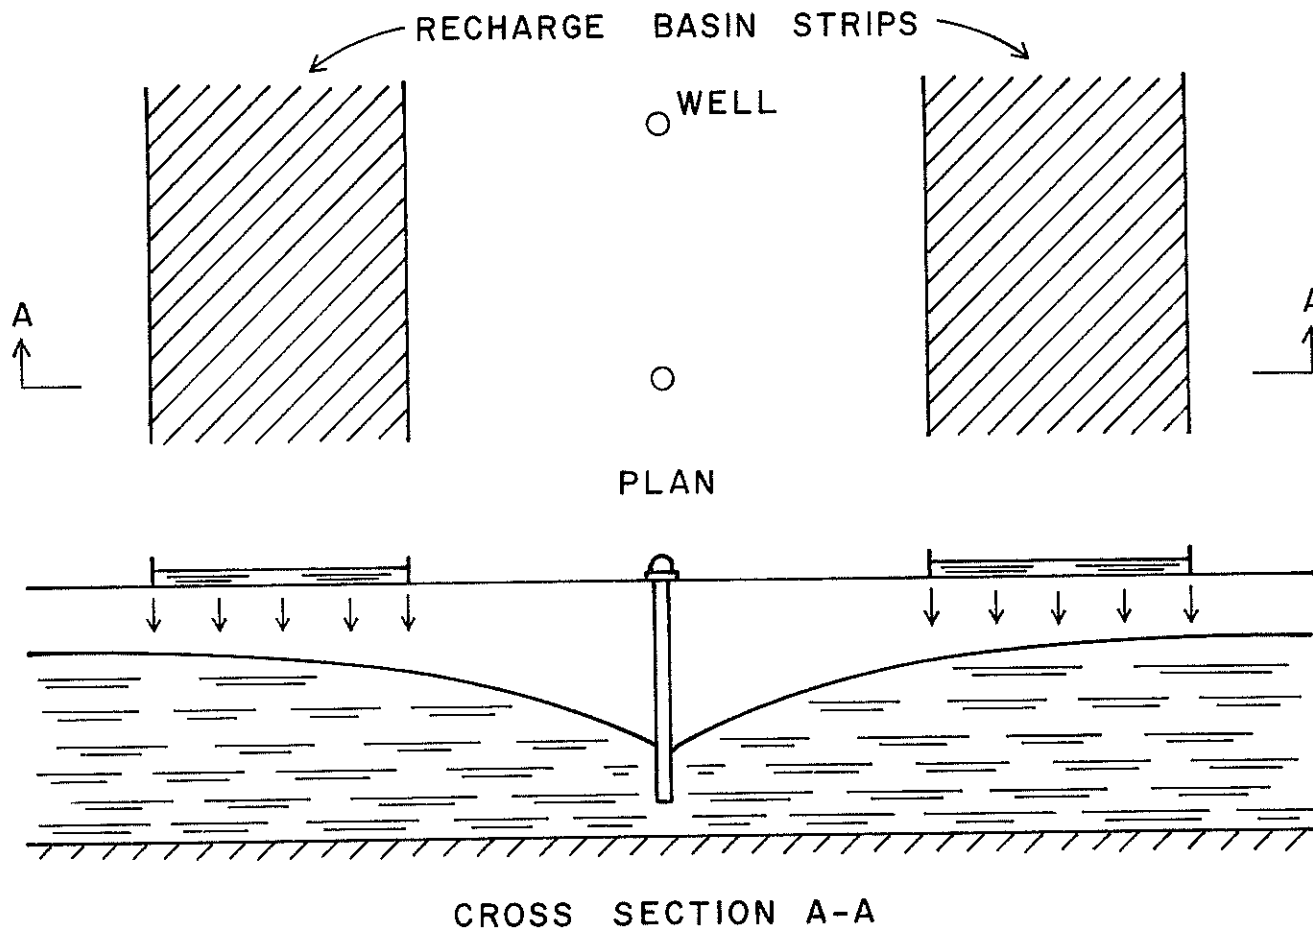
Plan and cross section of two parallel recharge strips with wells midway between strips.
